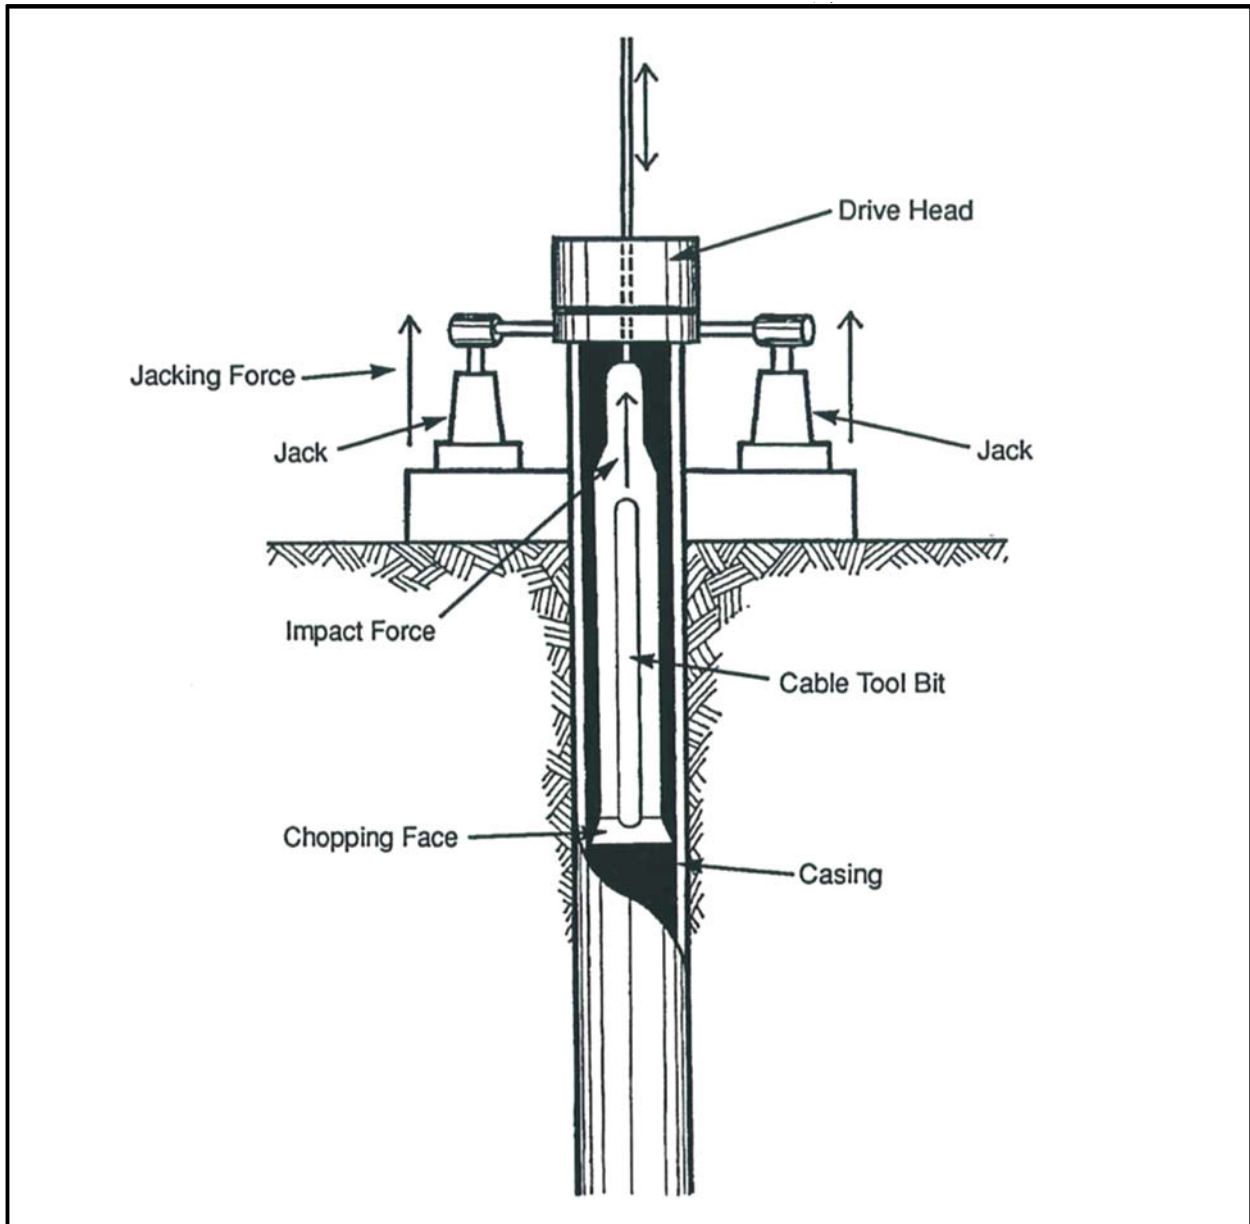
B. Using a Combination of Hydraulic Jacking and Percussion with Cable Stem to Remove Casing.
